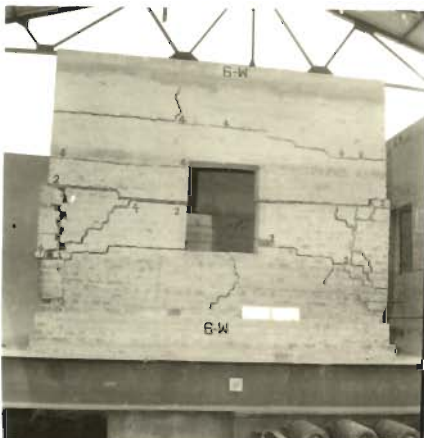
\_ NORTH - WEST AND SOUTH - WEST PORTIONS BADLY DAMAGED AND BULGED OUT (MODEL 6)
